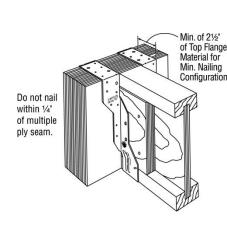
Typical THAI Hanger Installation with Minimum Nailing Configuration (See Table 5B)
